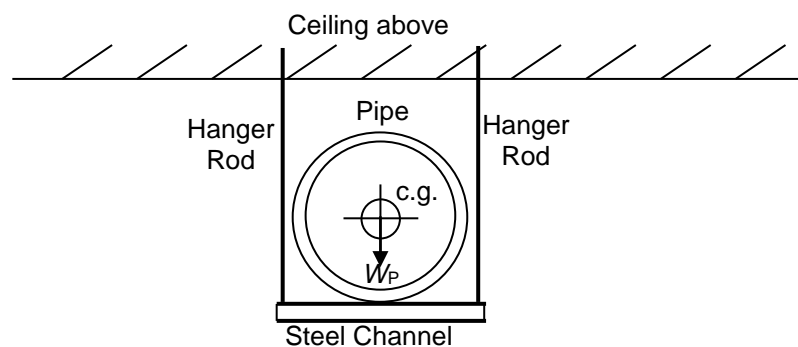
Hanging Frame (Supports and Bracing) for suspended Equipments
